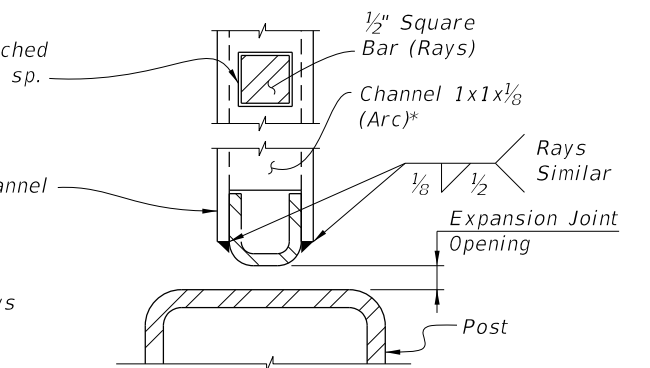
A" INTERMEDIATE RAIL/RAY CONNECTION
